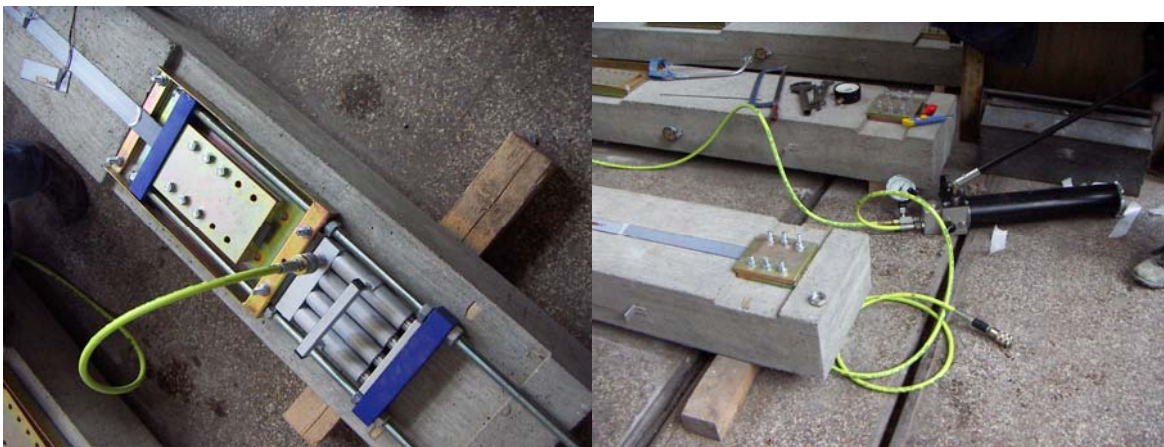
Detail drawing gun, (four coupled piston all of piece) and mechanical piston
